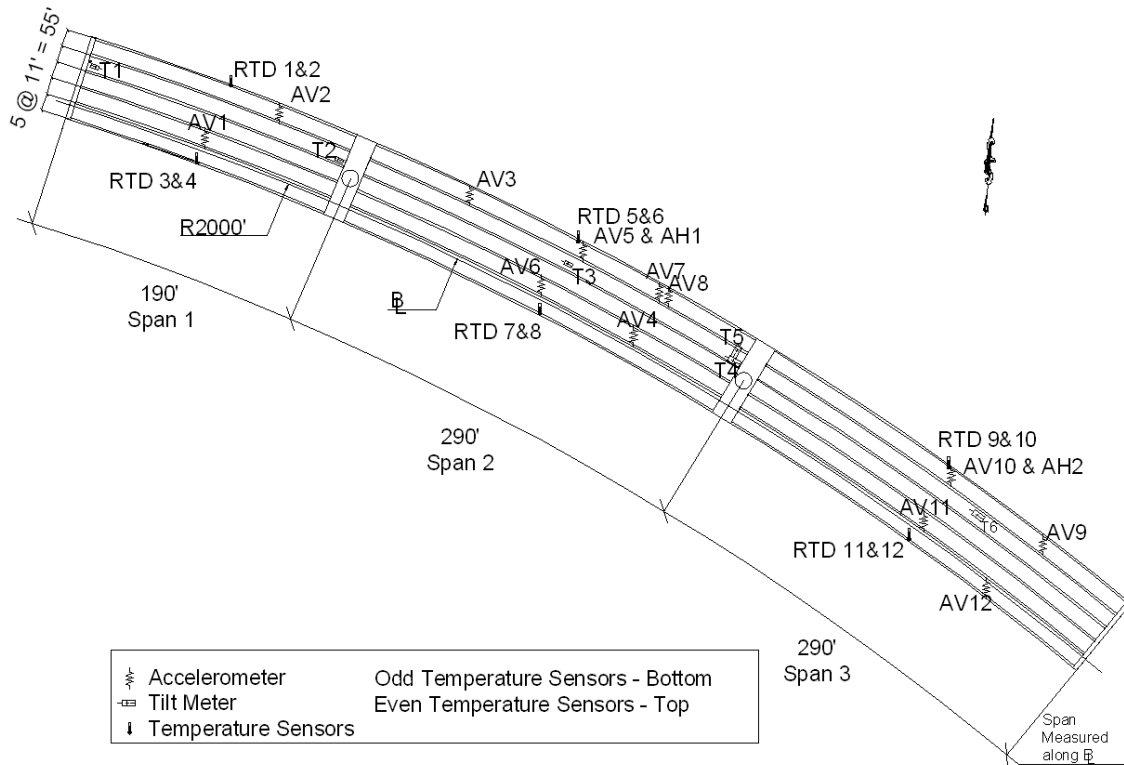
Locations of Sensors for Post-Tensioned Box-Girder Bridge
